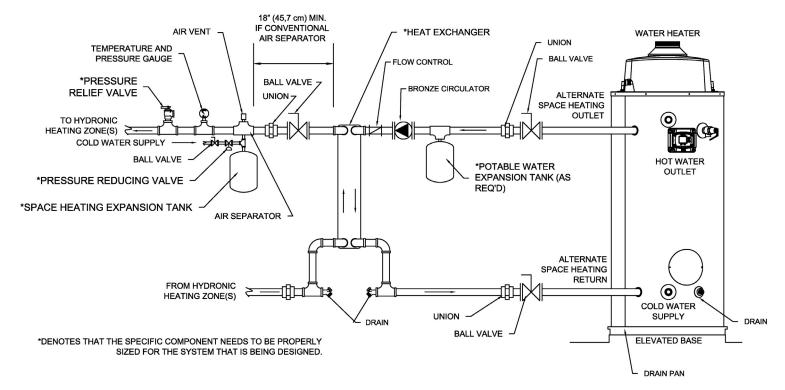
Typical Plumbing Schematic for Zoned Heating.
